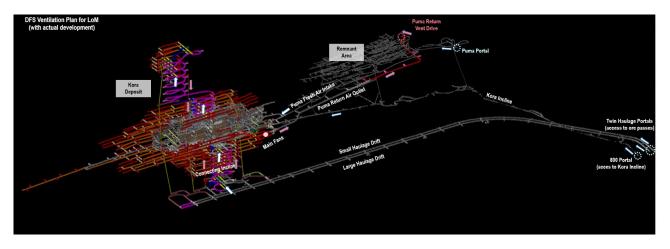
DFS LOM Ventilation Plan Profile Facing Northwest
